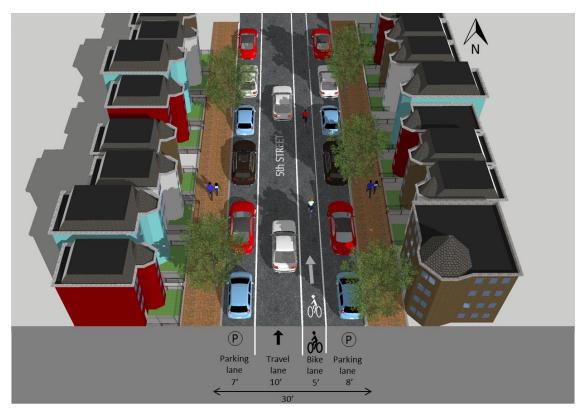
No-build (Alternative 0), 5th Street North of New York Ave
